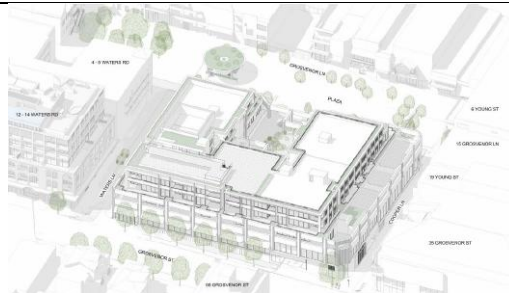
Revised 3D Modelling from the north (Source: SJB Architects)
